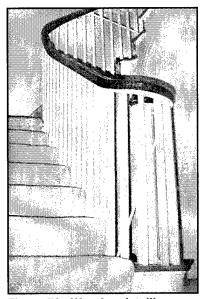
Wooden detailing on stair railing identifies the craftsmanship that was used.
